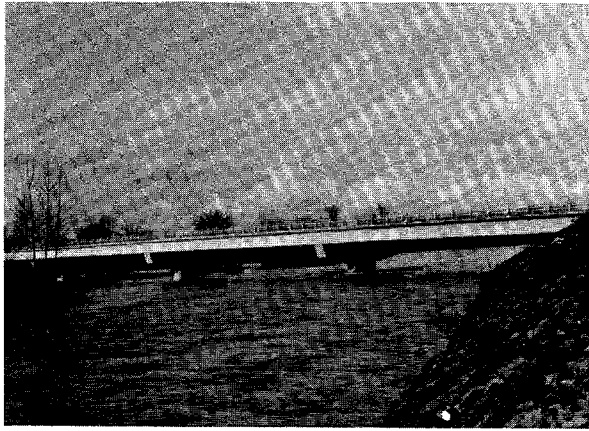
View of upstream side of completed bridge, South Santiam River. Wall-type piers minimize skewness to flow. (From Oregon Dept. of Highways.)
